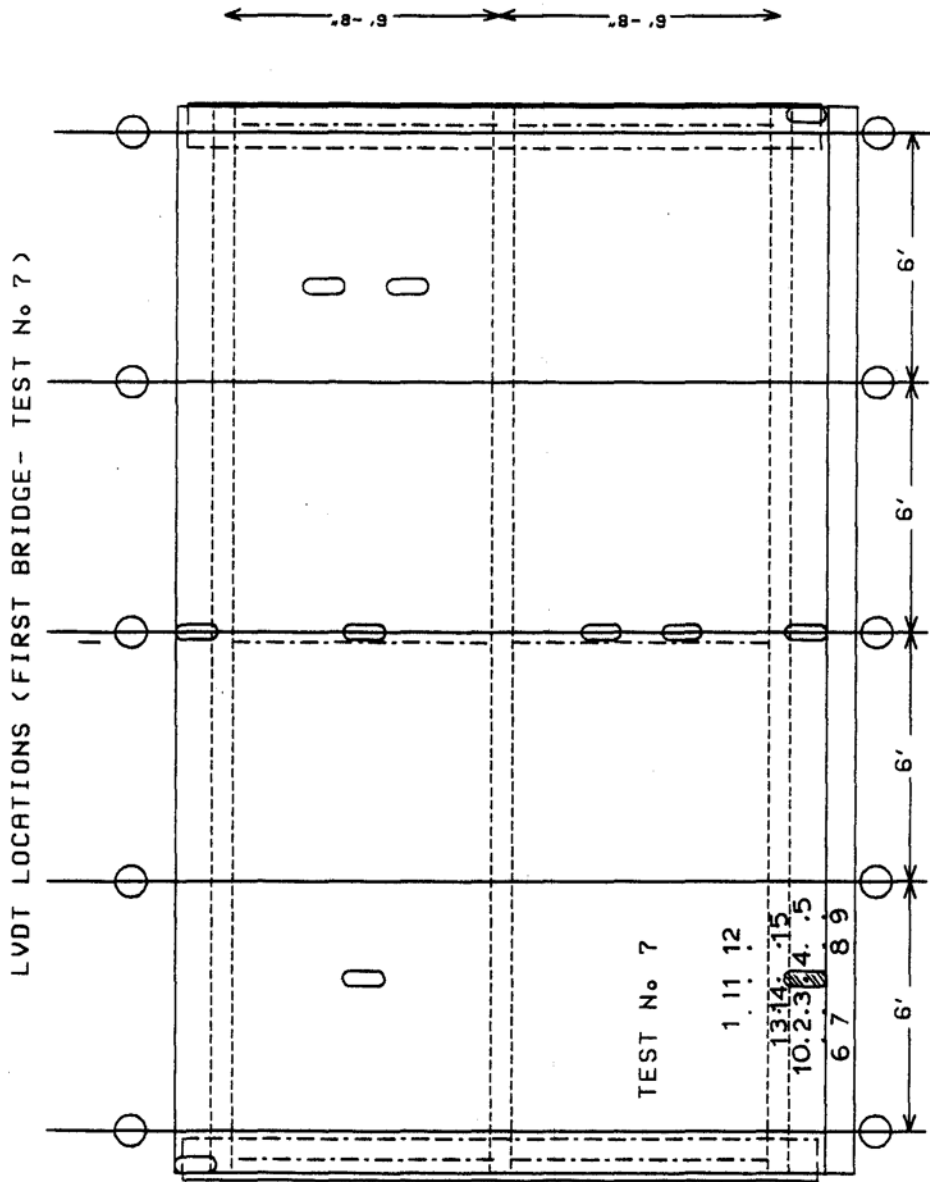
LVDT Locations (First Bridge - Test No. 7)
